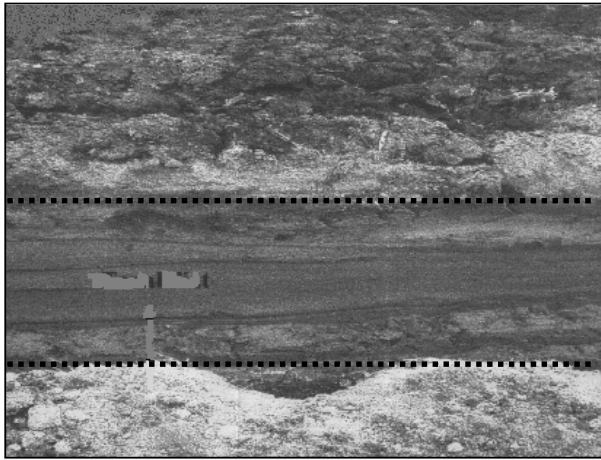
Soil Layer Under Leachate Collection Pond at Pulau Burung Landfill Site.⁶
